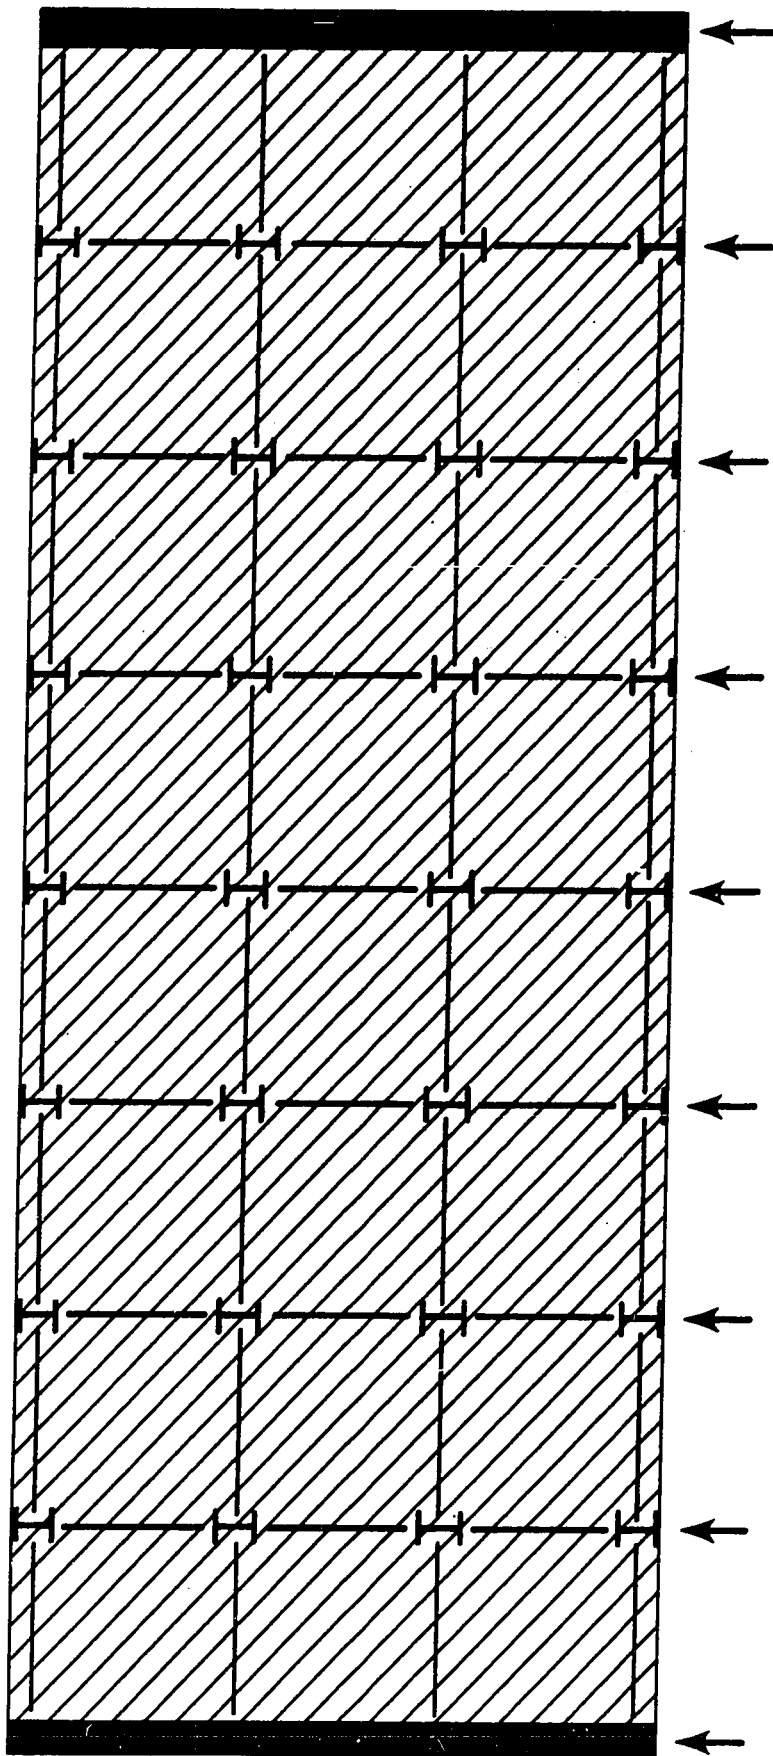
PLAN VIEW - EXAMPLE BUILDING
